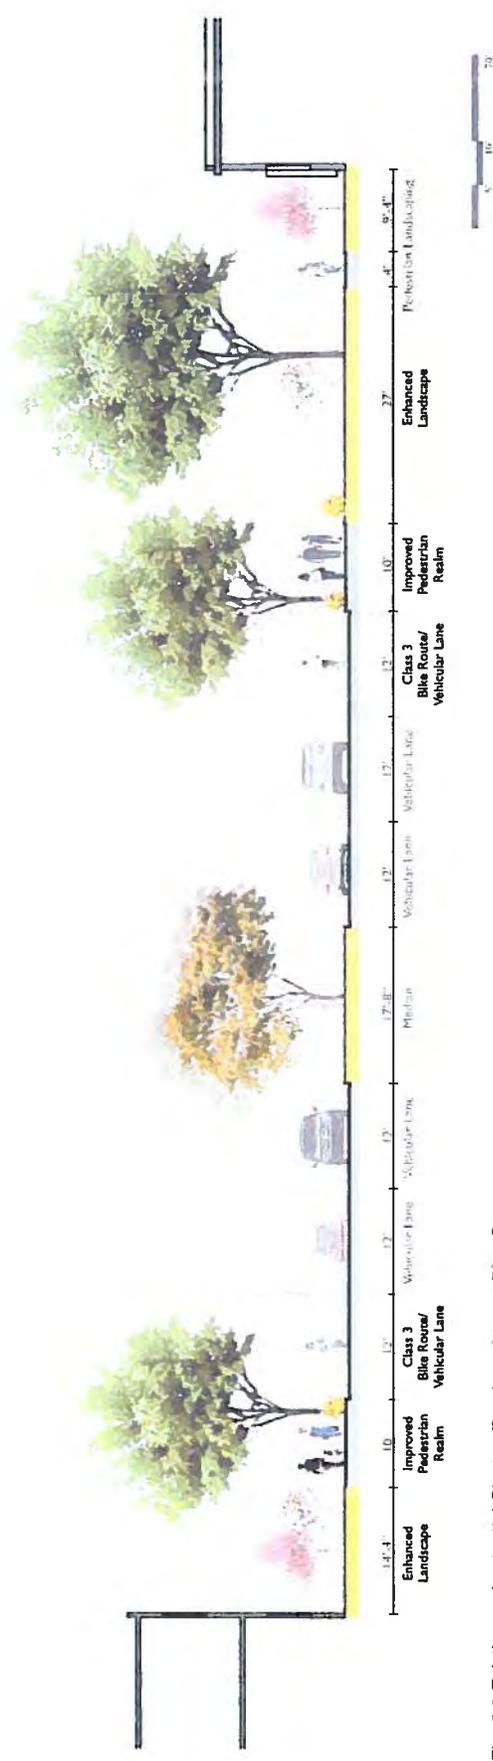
Existing and potential Clayton Road sections at Pine Street
